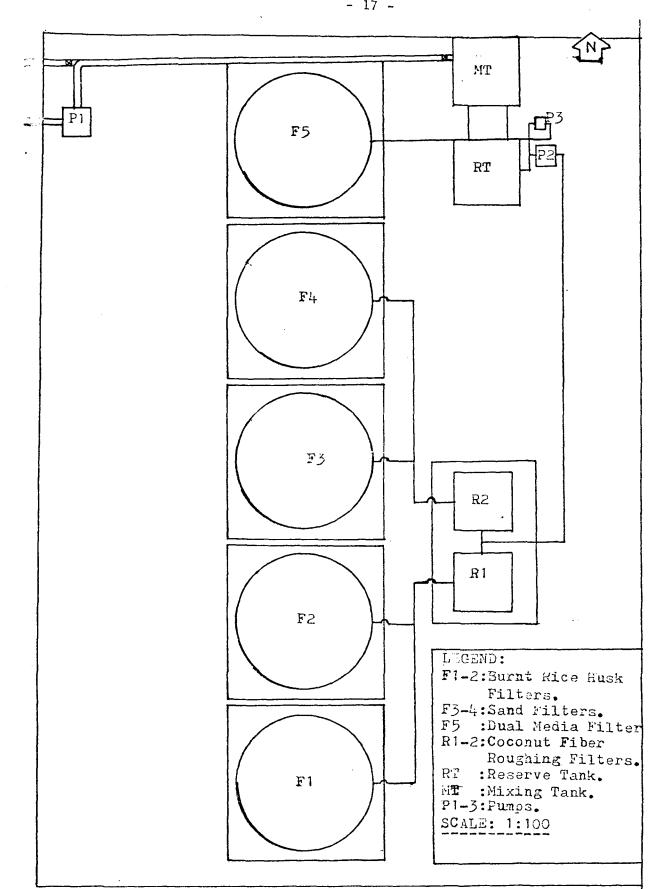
Plan View for Pilot Plant and Filter Set-Up
